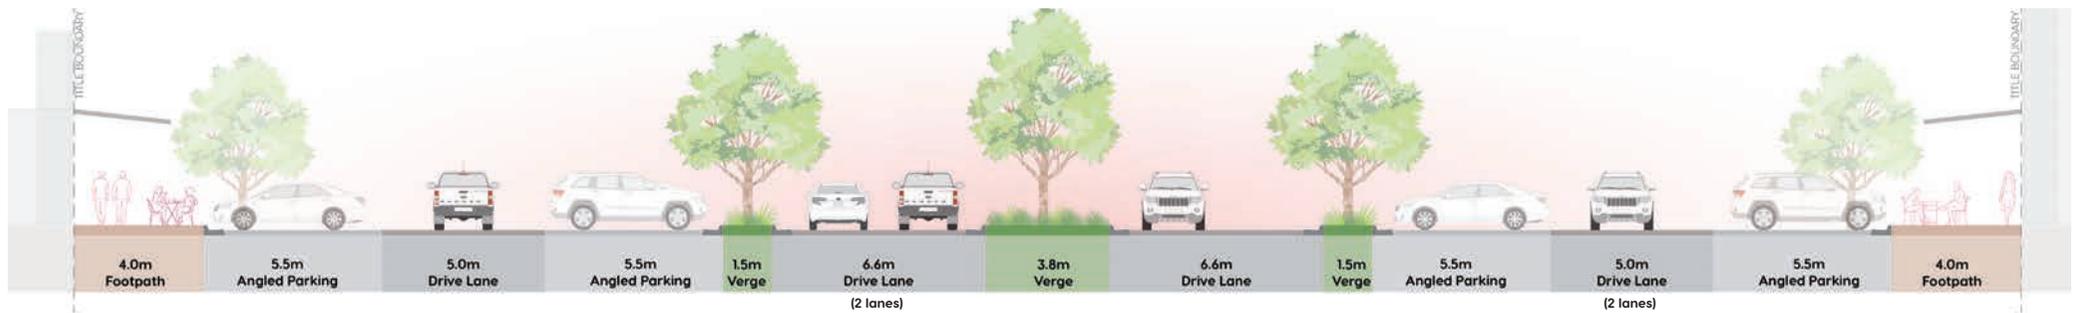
High Street typical street cross section - existing conditions currently found between Smith and Palmerston Streets
